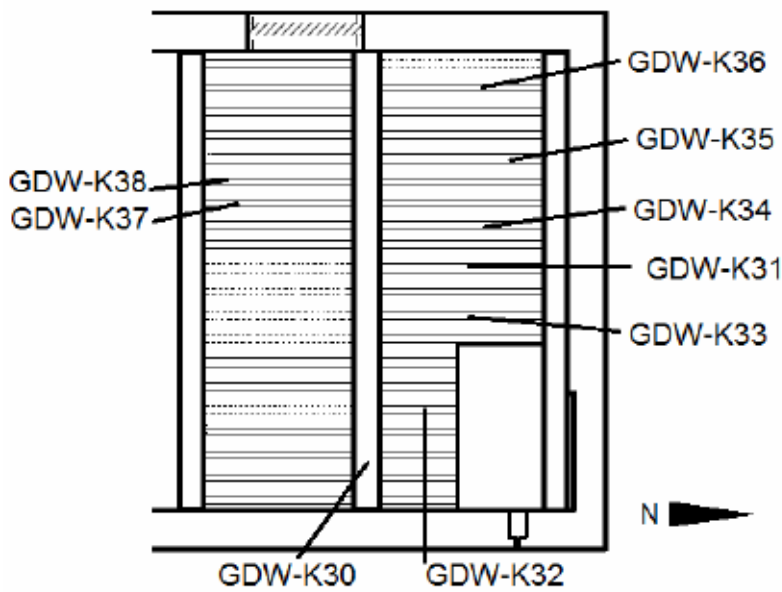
Second-floor plan, showing the location of samples GDW-K30-38 (after Wood and Stephen Design Management)
